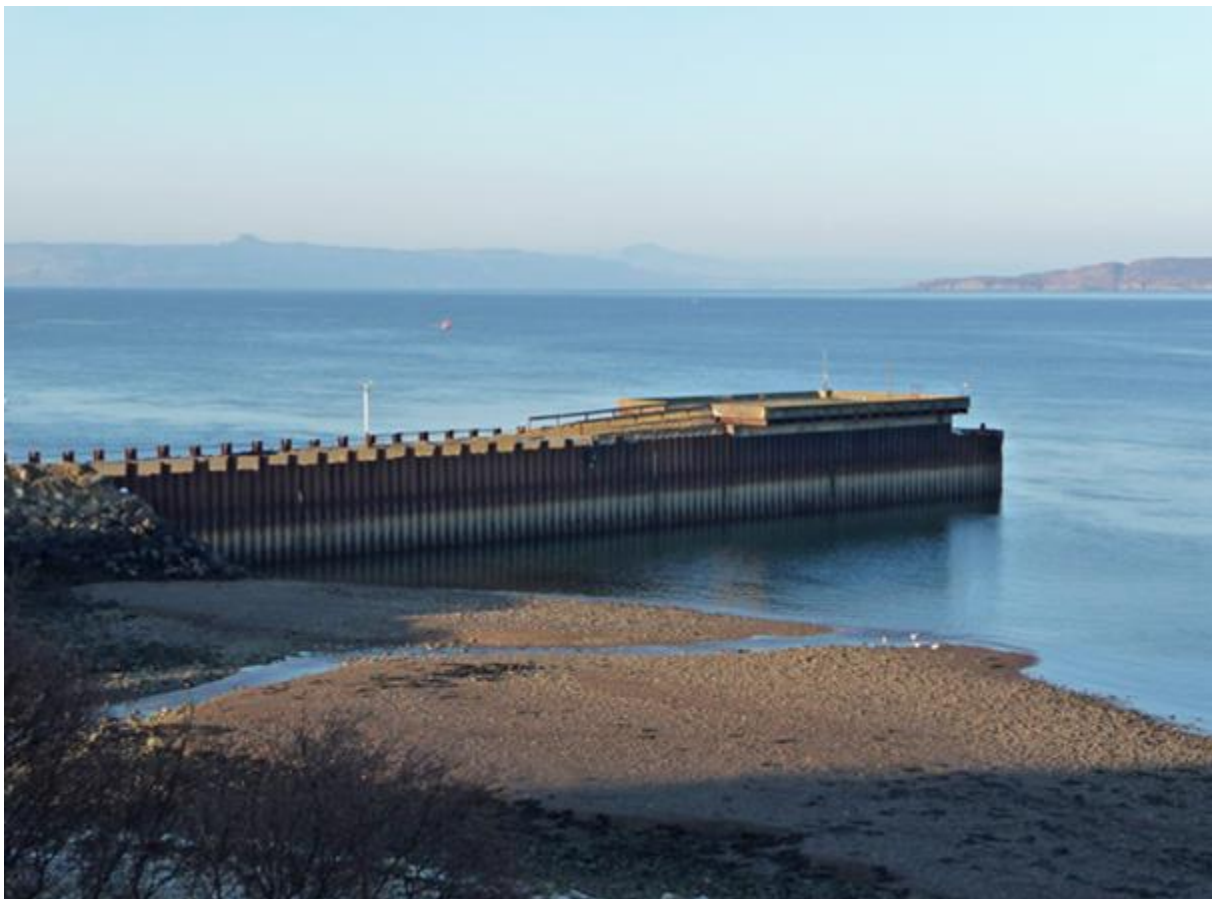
The existing solid sheet piled Pier at the study site at Kyleakin¹.
